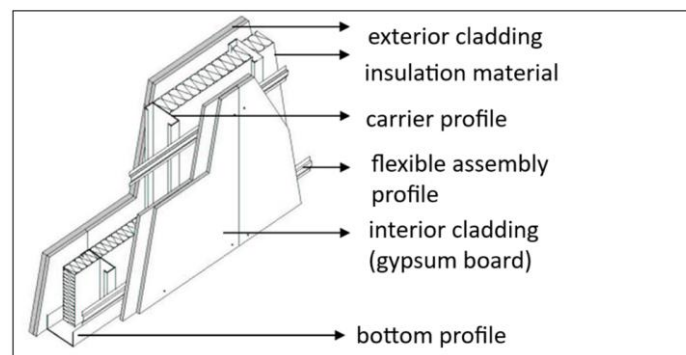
Light Steel Wall Section (Ekinci, 2006)
